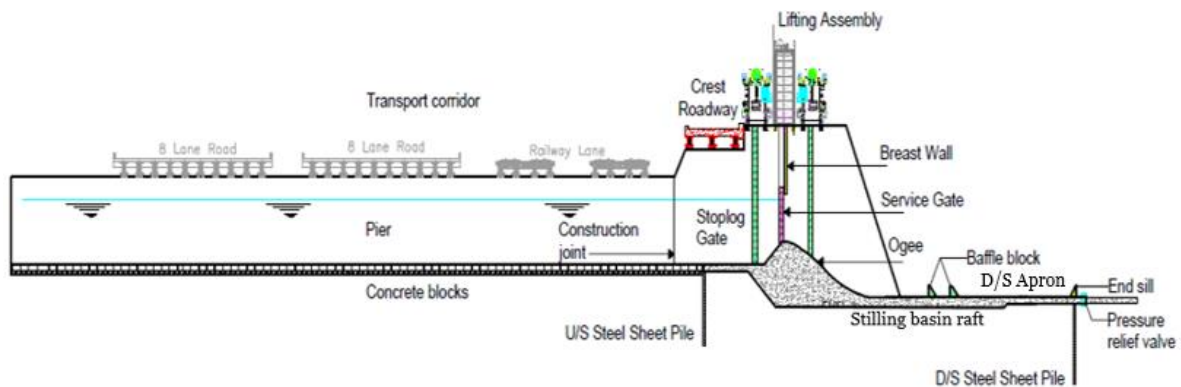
Schematic diagram of Flood Regulator with Concrete Apron and Sheet Piles
